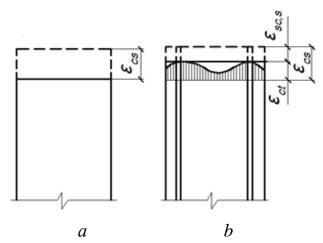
Strain of shrinkage for specimens: a – concrete; b – reinforced concrete
